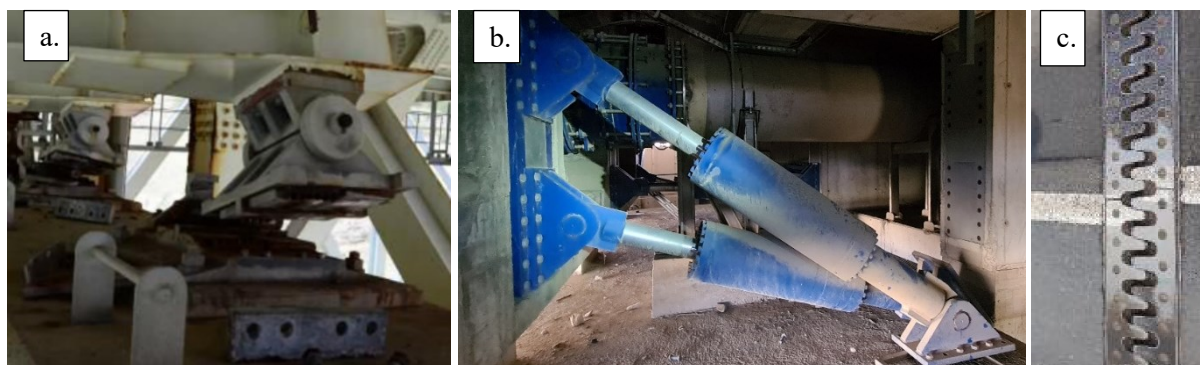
a. Fixed bearing failure [32]; b. Dampers detachment; c. Transverse movement of expansion joint [33]
